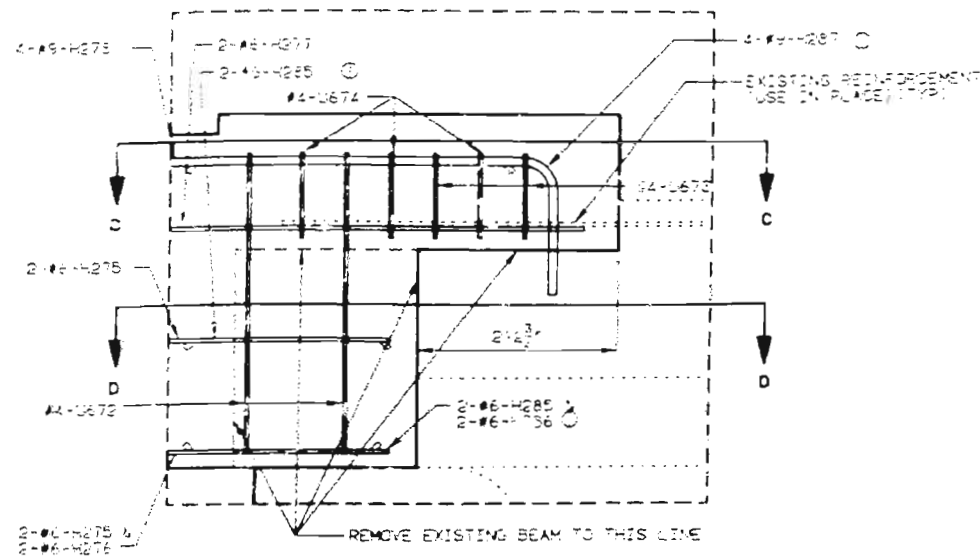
## DETAILS OF INT. BENT NO. 11 (SOUTHBOUND LANE)
